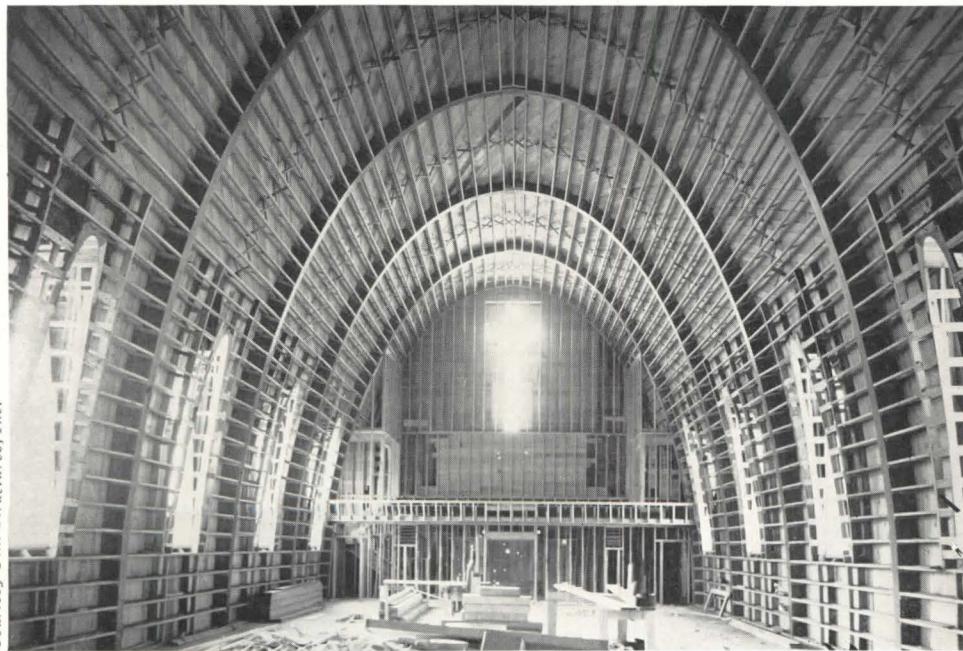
Laminated parabolic arches are a striking expression of wood's renaissance.
